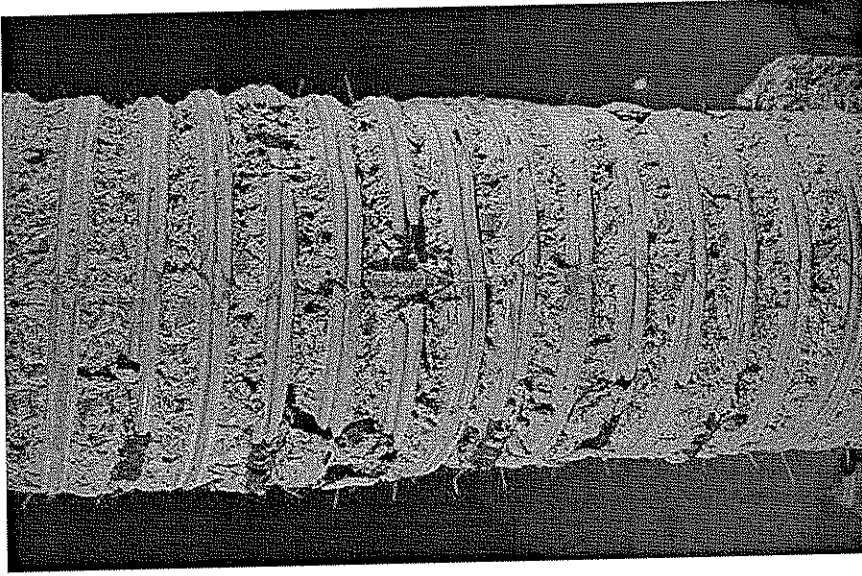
Schematic drawing of post-test appearance of Specimen 14-A'.
